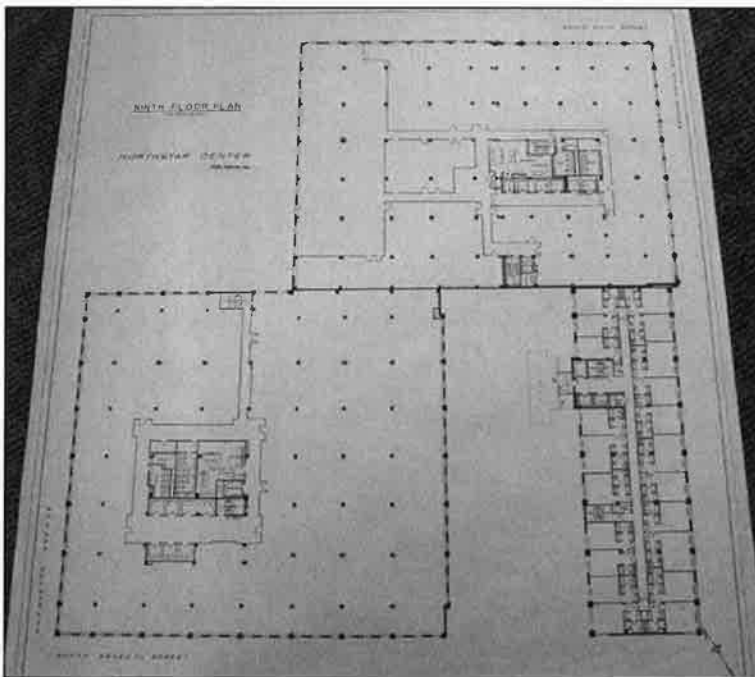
As-built drawing showing typical floor plates of the ninth floor and the levels above. The Pillsbury Building only has thirteen floors, while the Cargill Building and the hotel each have seventeen floors.
